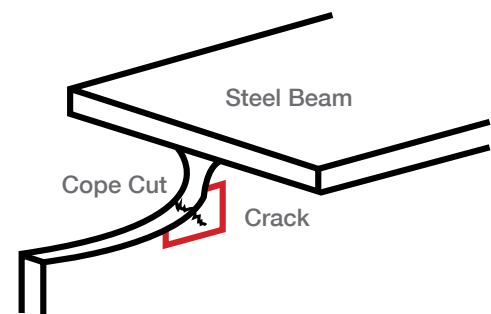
Cope cracks in structural steel beams after galvanizing
